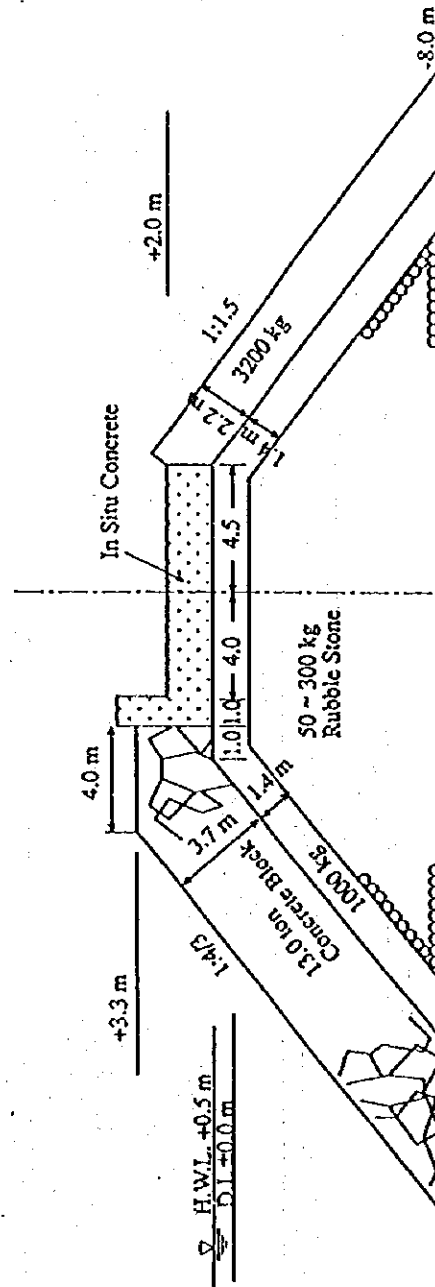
Standard Cross Section of Breakwater (-8.0m)
